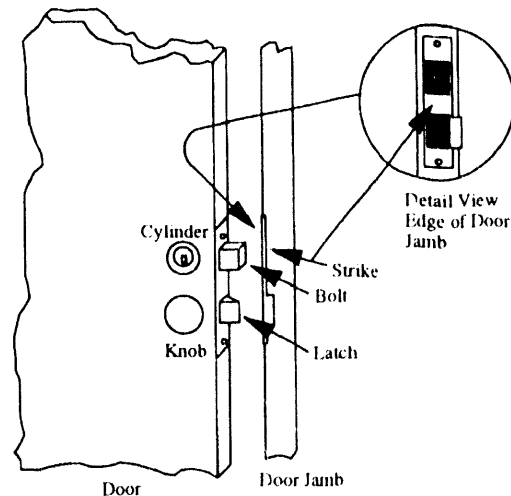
Typical mounting configuration of a bolt, strike, and latch
